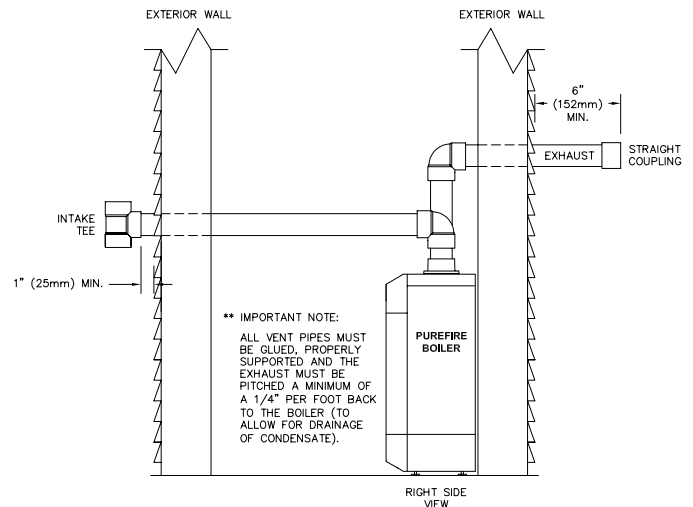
Exhaust & Air Inlet on Opposite Walls
